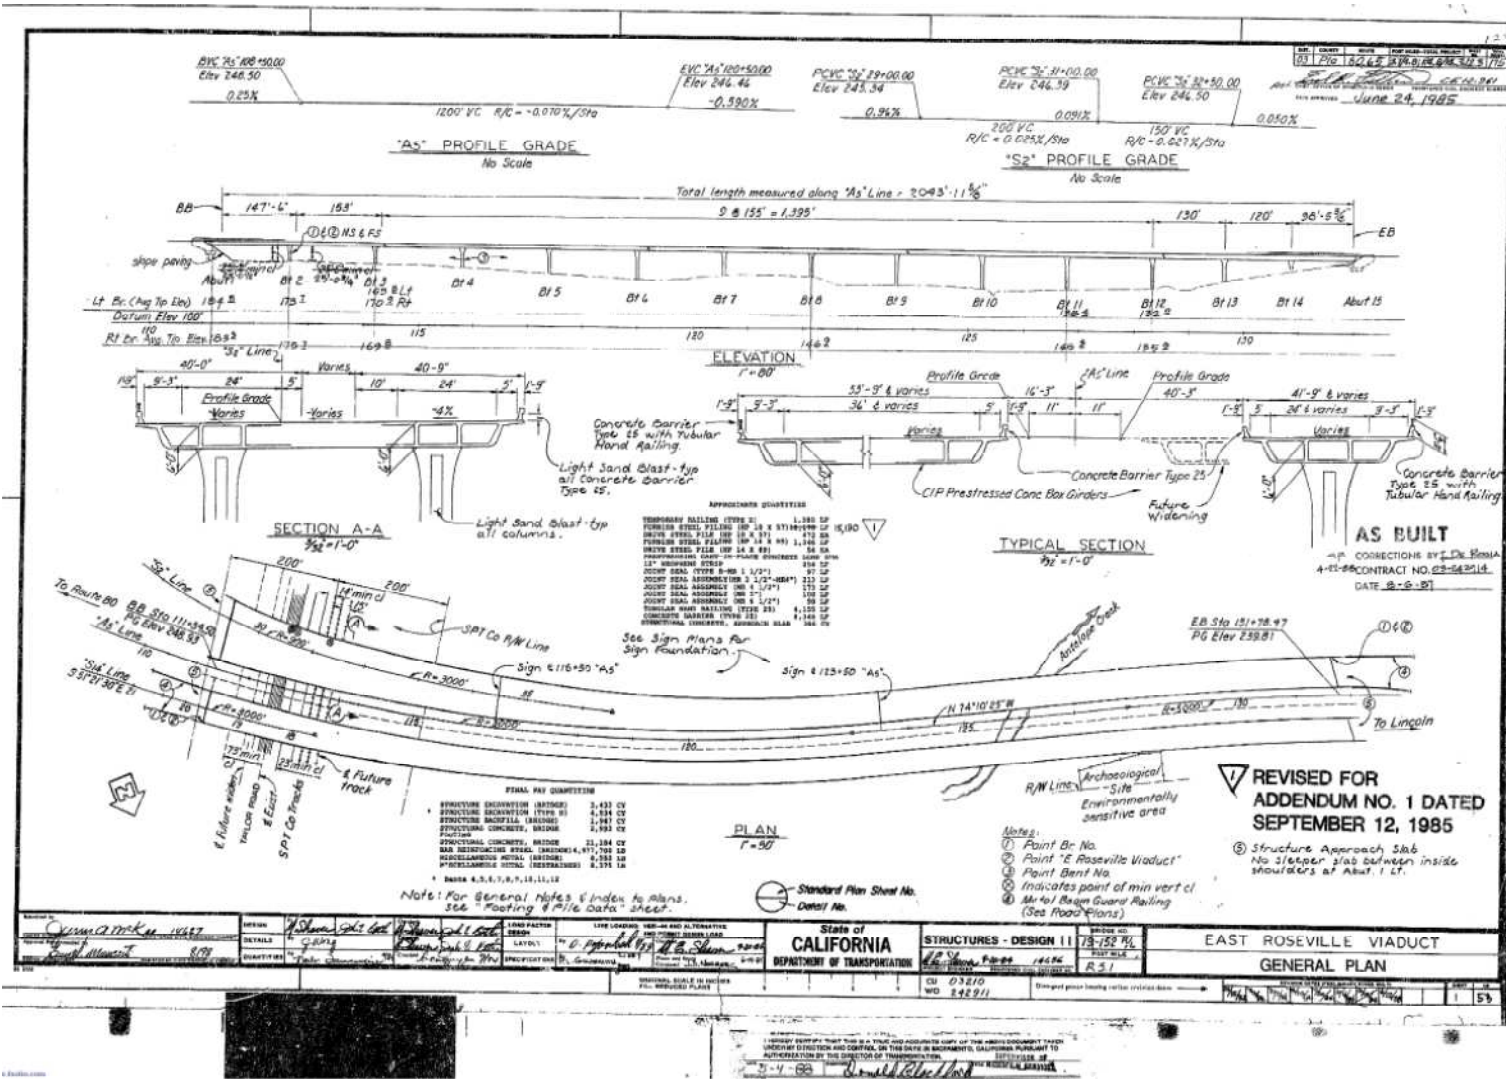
East Roseville Viaduct NB and SB Structures As-built Plan (1987)
